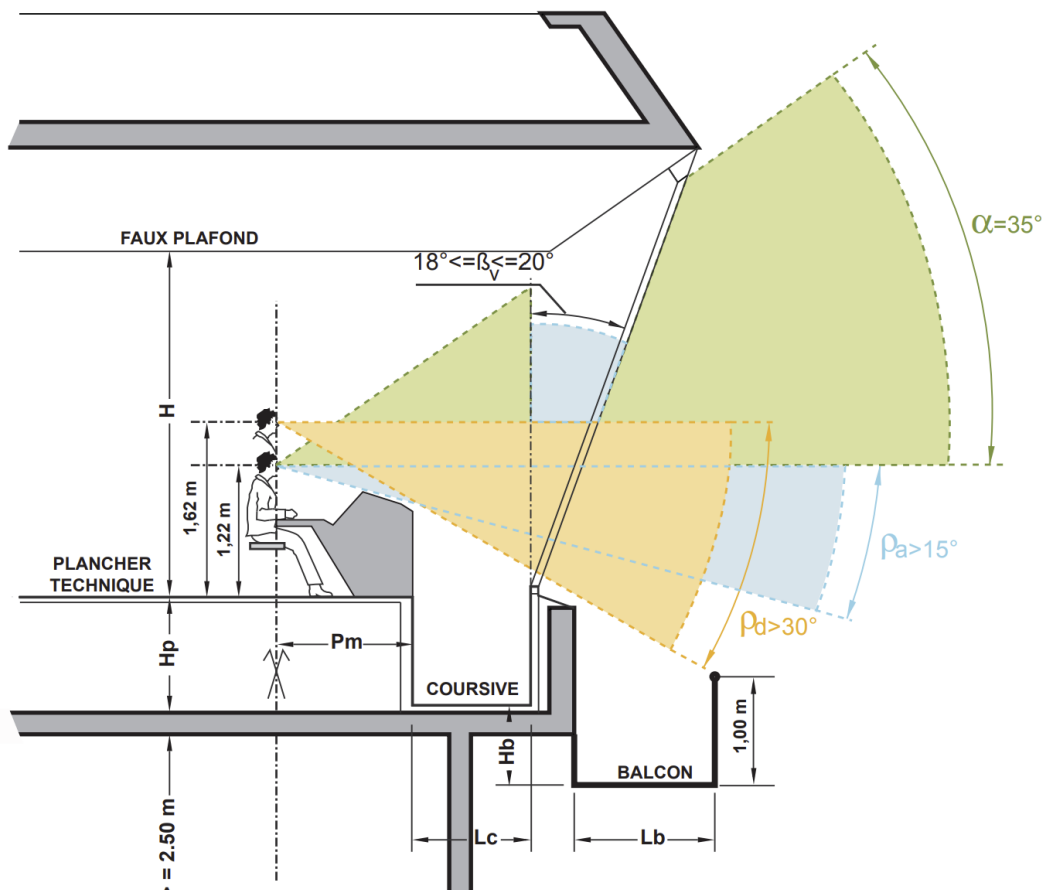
Cross section of the Control room -- (Département Bâtiments 2007).
